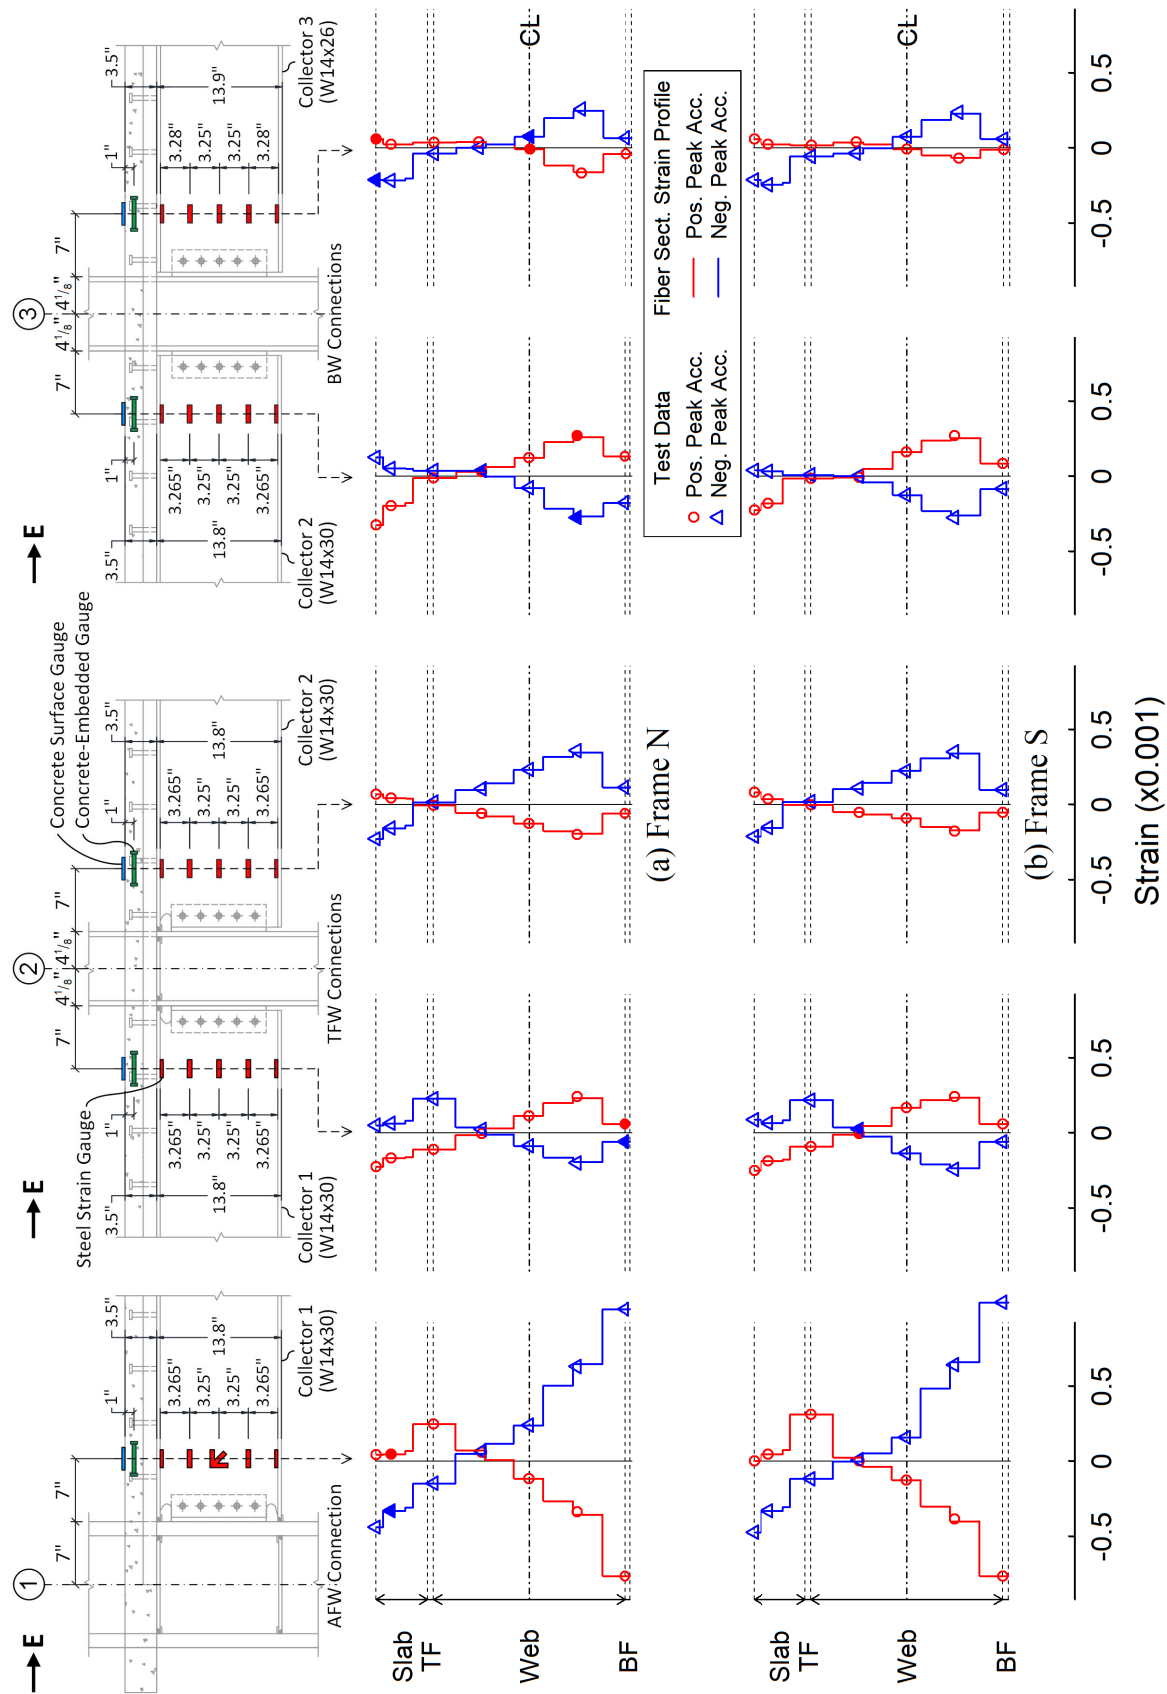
Test 1-3: Fiber Section Strain Profiles near Collector-to-Column Connections (2<sup>nd</sup> Floor)
